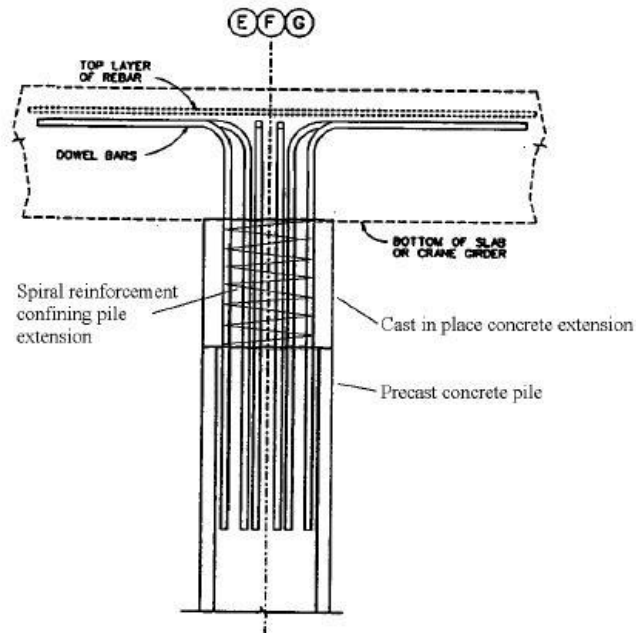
Typical prestressed concrete pile moment connections with extended outward bent dowel connection (Roader, 2002)
